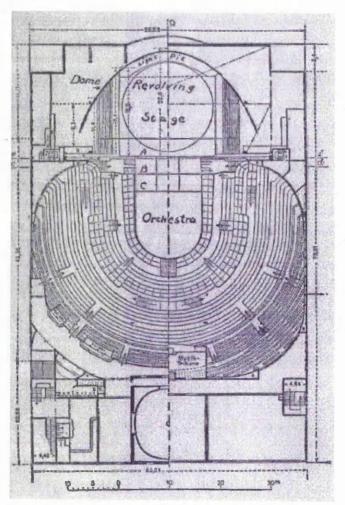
Grosses Schauspielhaus, 1919, Berlin. Arch: Hans Poelzig. Ground Plan.
